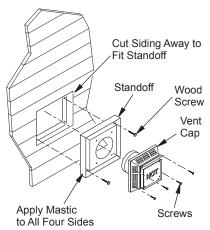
Installing Siding Standoff (Combustible Exterior Wall)
